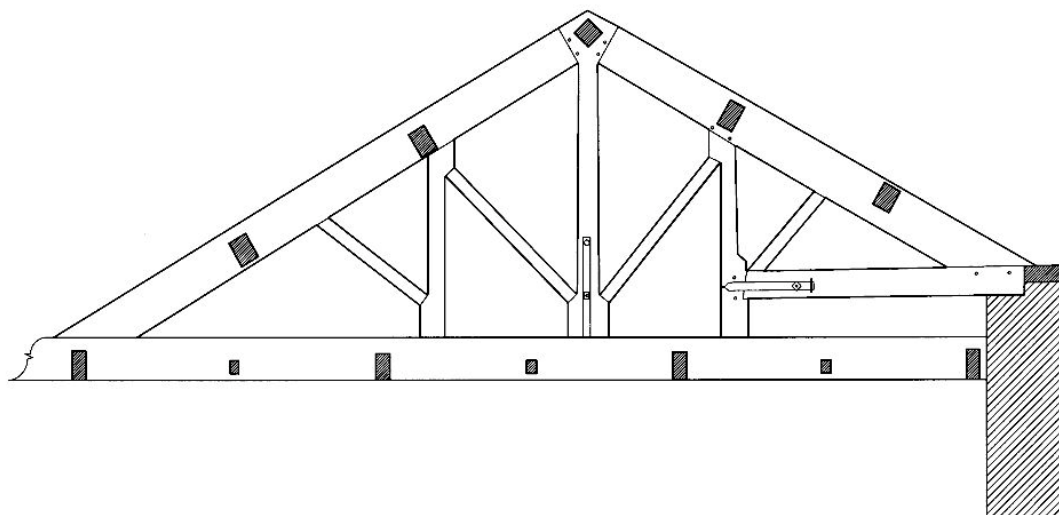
Lytham Hall typical full roof truss, EH survey drawing. This roof truss is typical of T1-T3, T6-T9 and T12-T14, and some of the trusses in T17-T22
